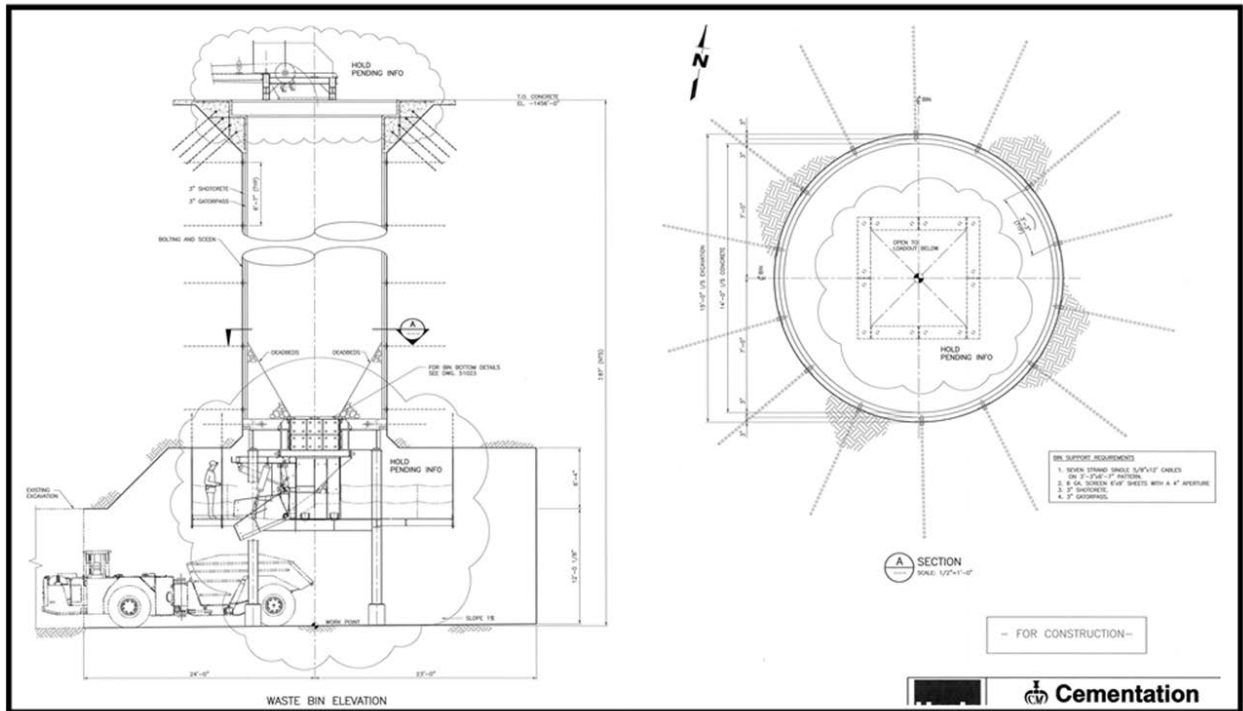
Elevation and Section View of South (Waste) Bin Final Design Condition
